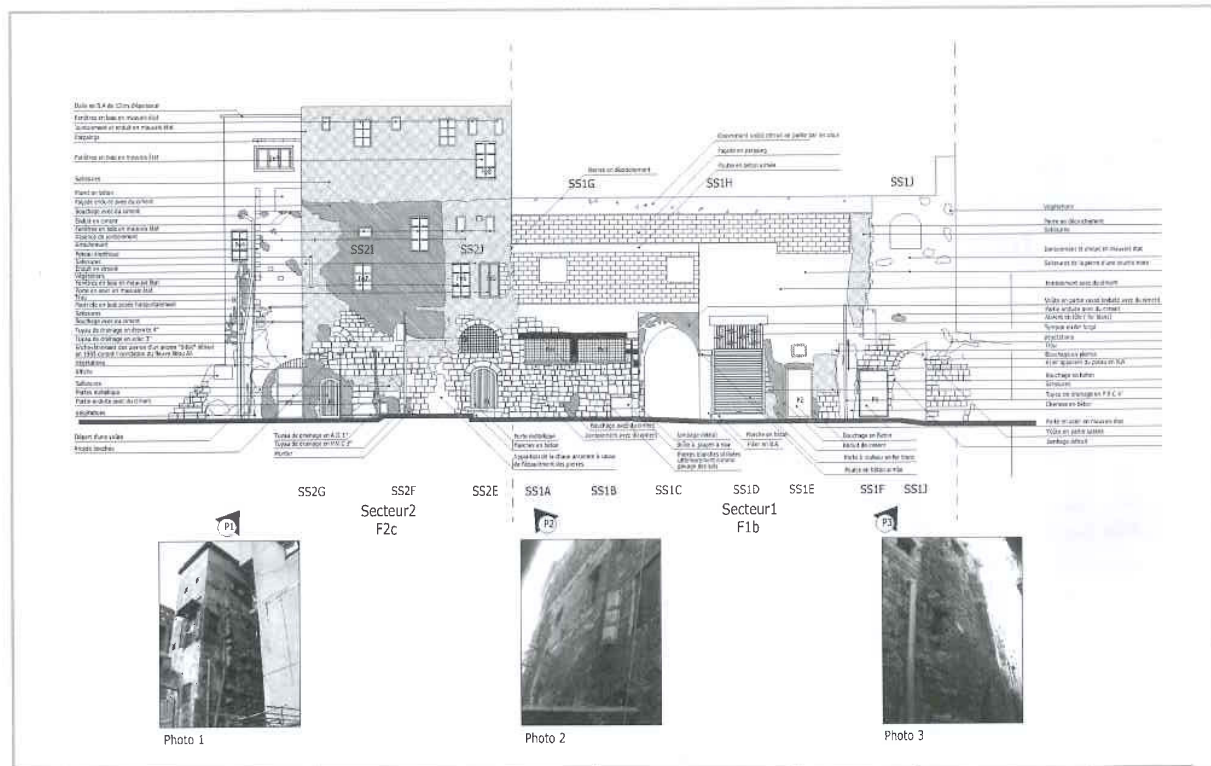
Eastern street elevation before restoration (Fischfish/Daoud 2003).
